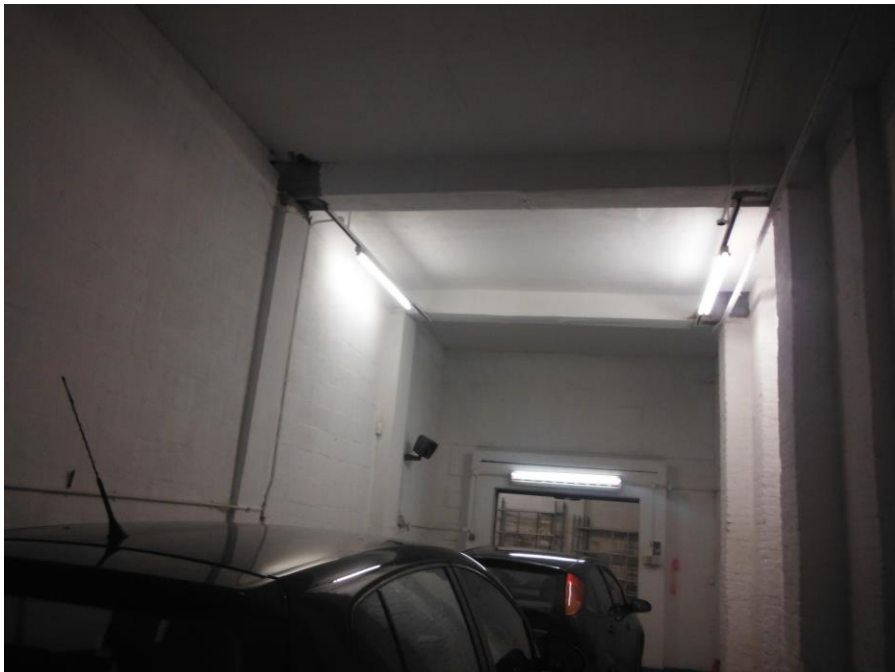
Ground floor loading bay – Non asbestos textured coating to ceiling
